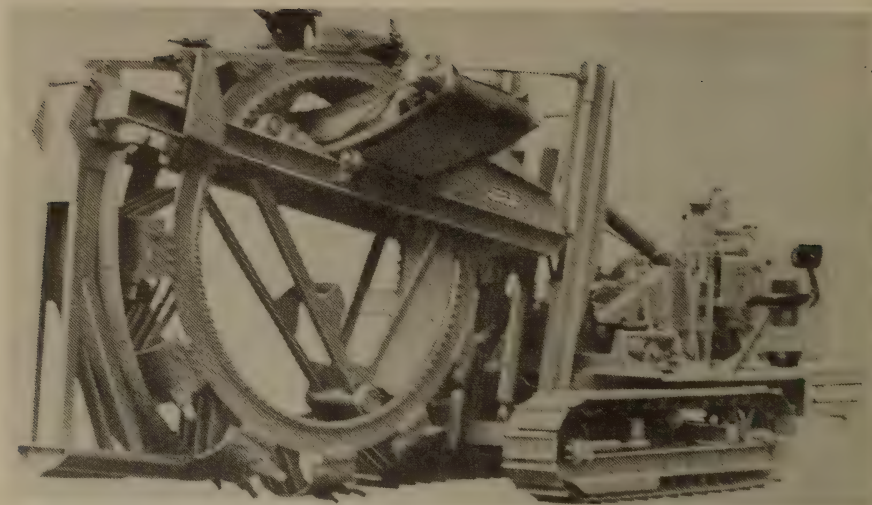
Wheel-Type Trenching Machine. (*Courtesy, Parsons, Division of Koehring Co.*)
